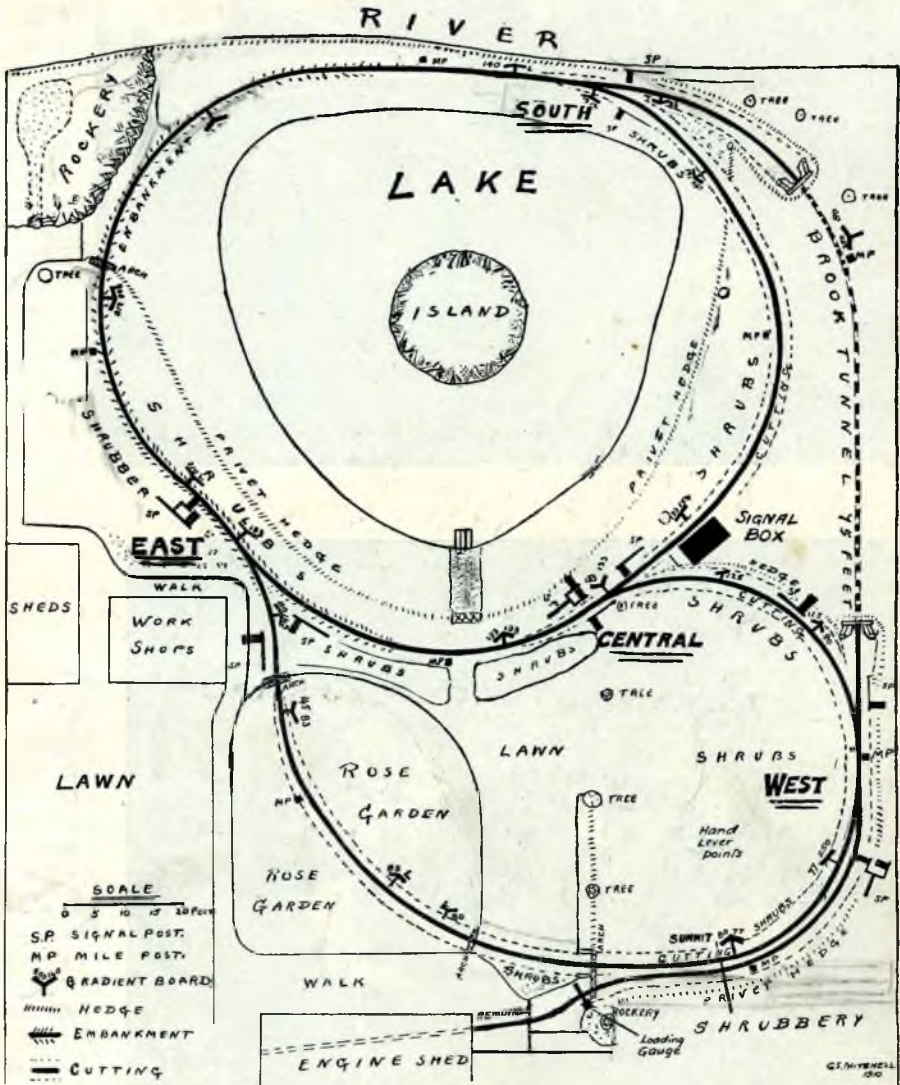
FIG. II.—PLAN OF BROOK HOUSE MODEL RAILWAY.
